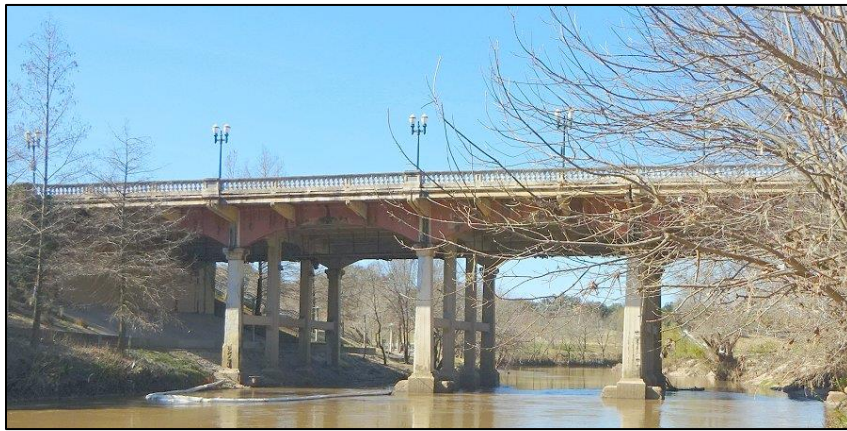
The Sabine Street bridge was built in 1924 with a neoclassical design with columns and capitals, a urn style railing, and arching side panels. (Photo: Louis F. Aulbach)
